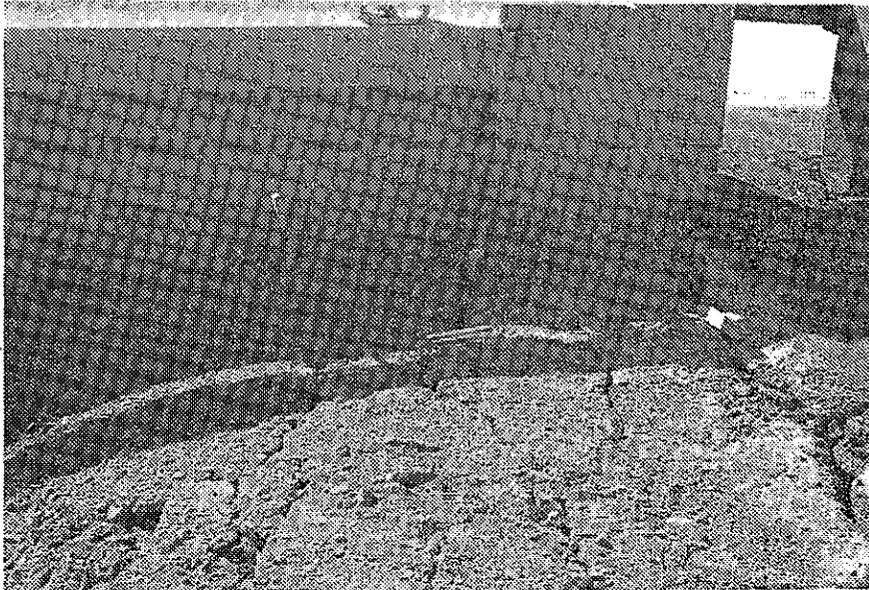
Fill cracking and settlement in median at Yarnell Street Undercrossing.
